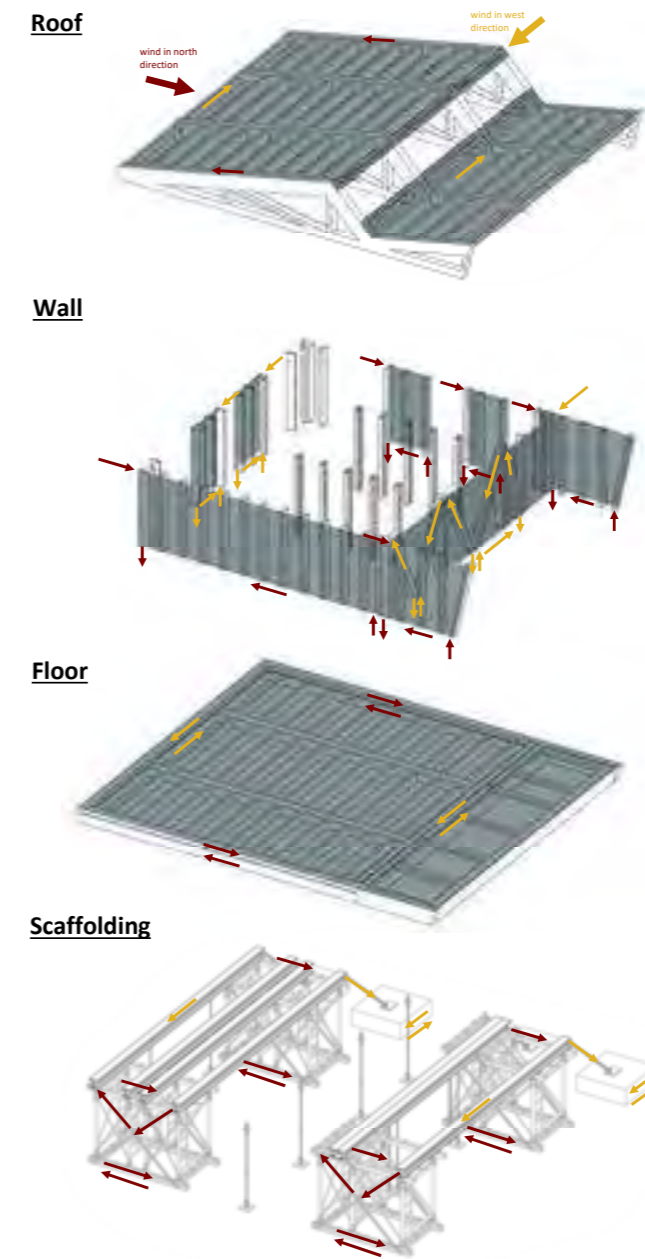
46. Structural design HDU – force diagram horizontal loads
